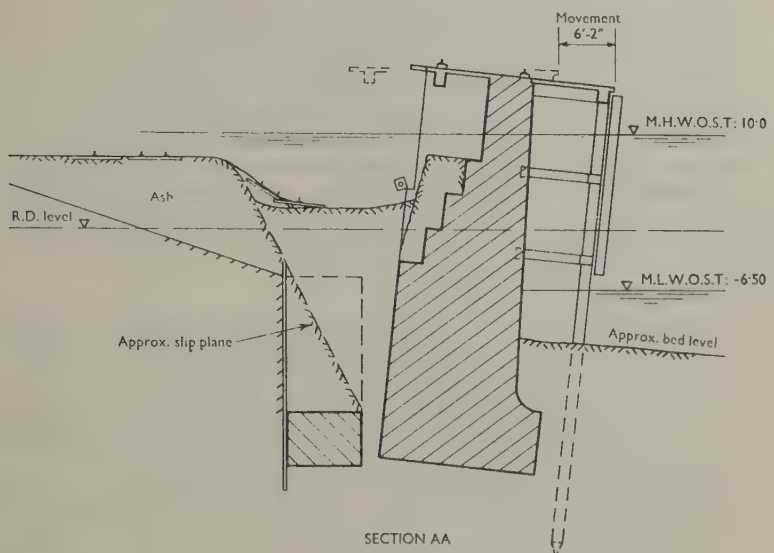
TYPICAL SECTIONS AFTER 1953 FAILURE
